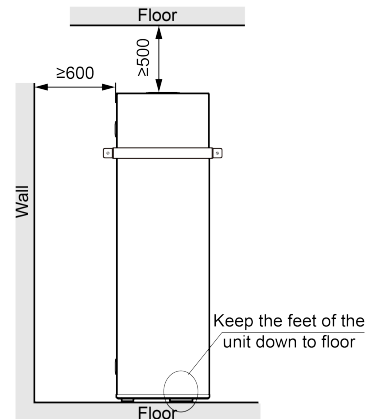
Space requirements for Installation of the water tank (Unit: mm)
